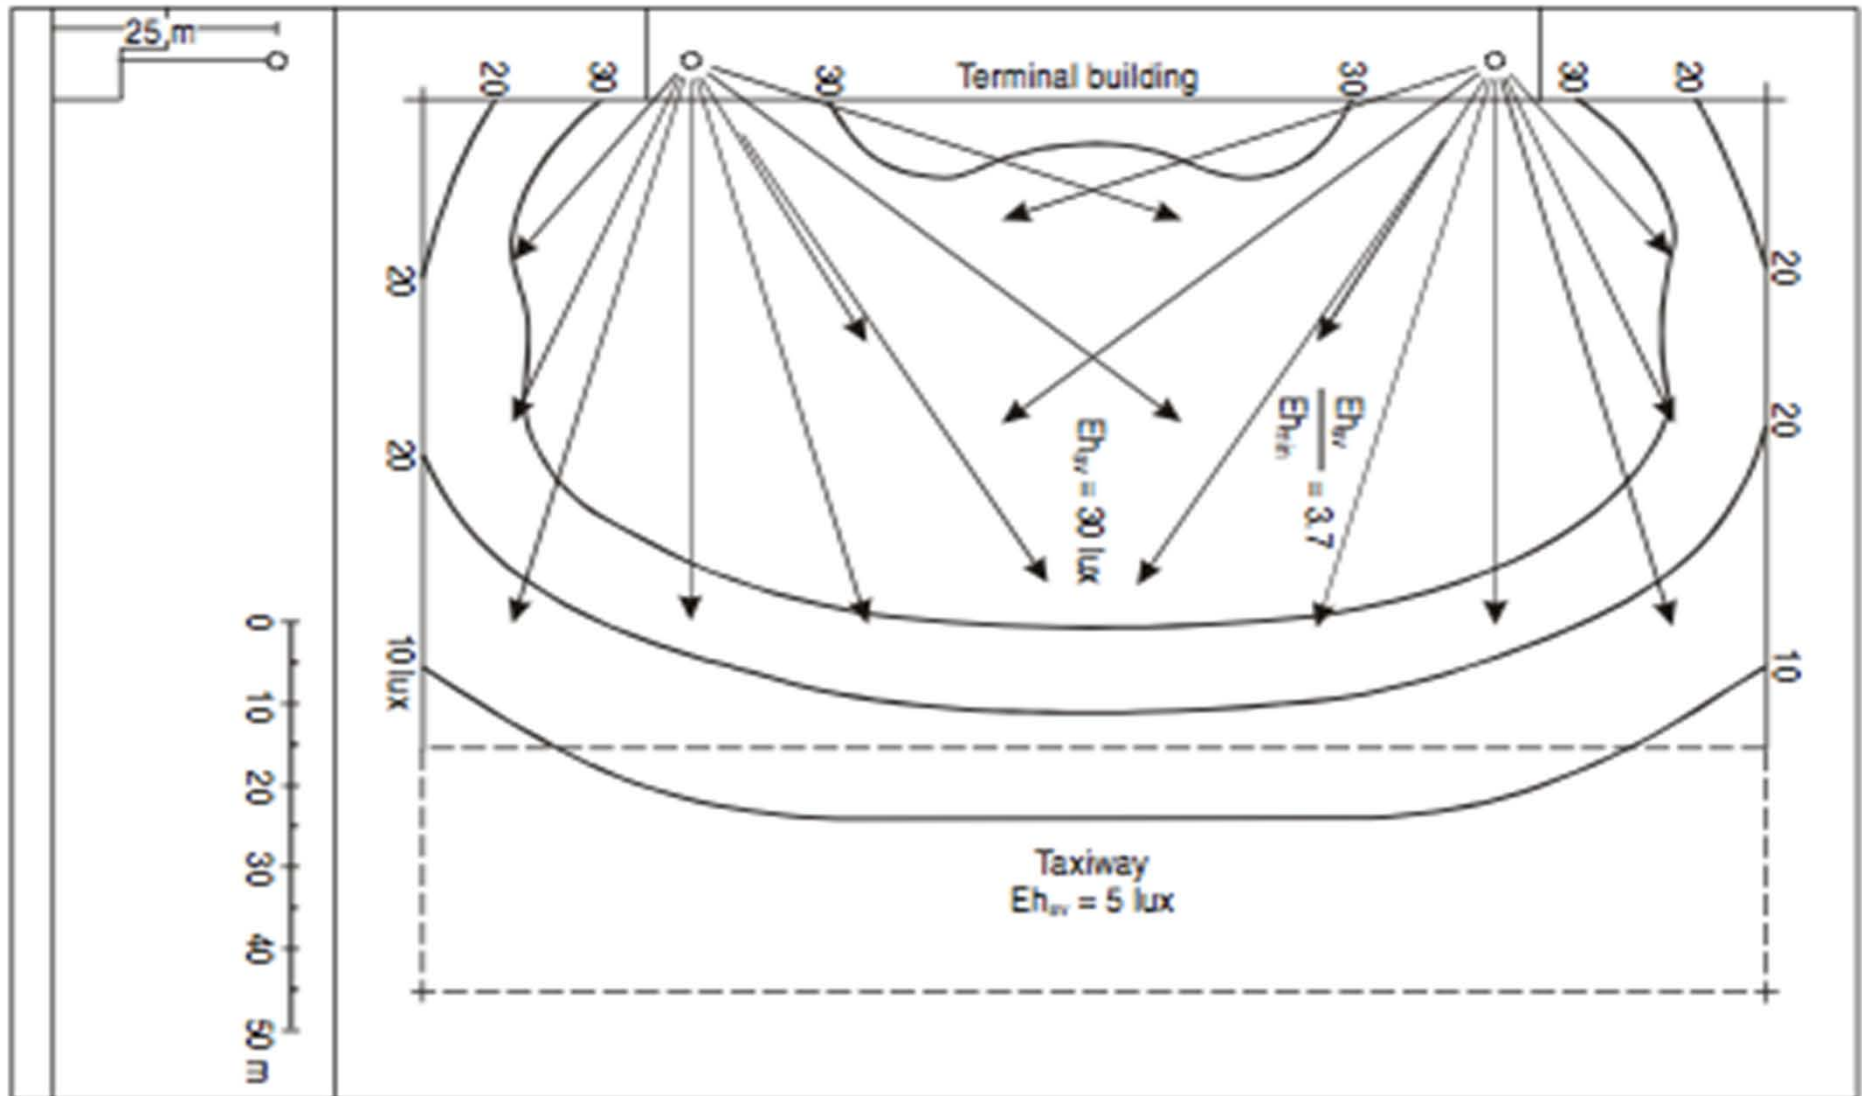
Typical floodlight arrangement and aiming for nose-in parking
